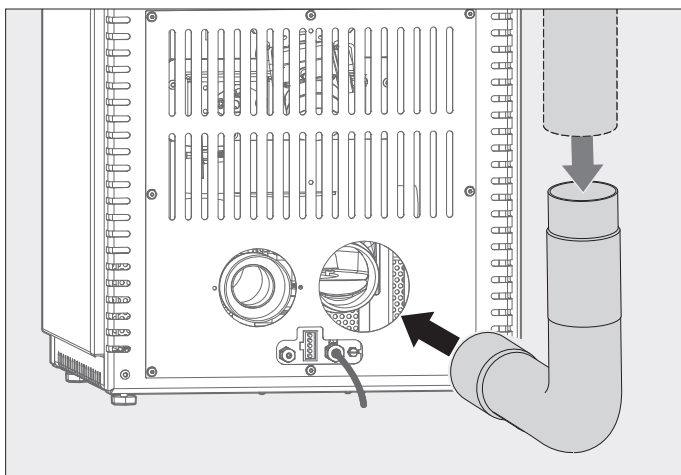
Plug the exhaust pipe (on site) into the connection
